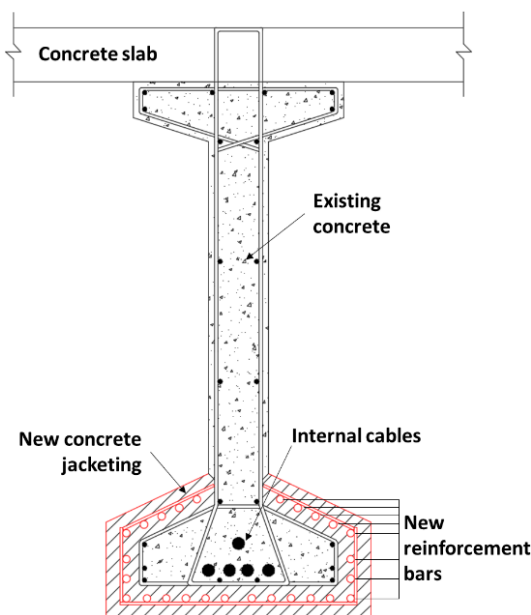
Strengthened configuration of the cross-section of the case-study prestressed reinforced concrete girder through reinforced concrete jacketing.
